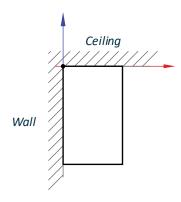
Hatched area indicating the corner of the ceiling and a wall.
